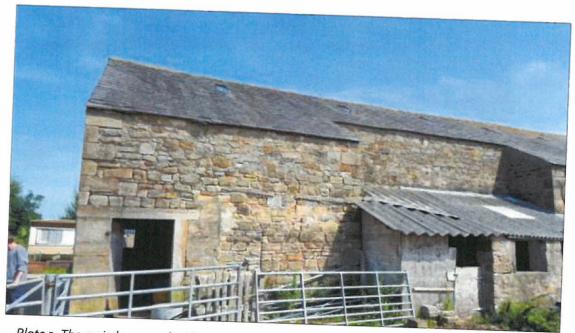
The main barn south side overview showing stone walled, open windows and doorways.
